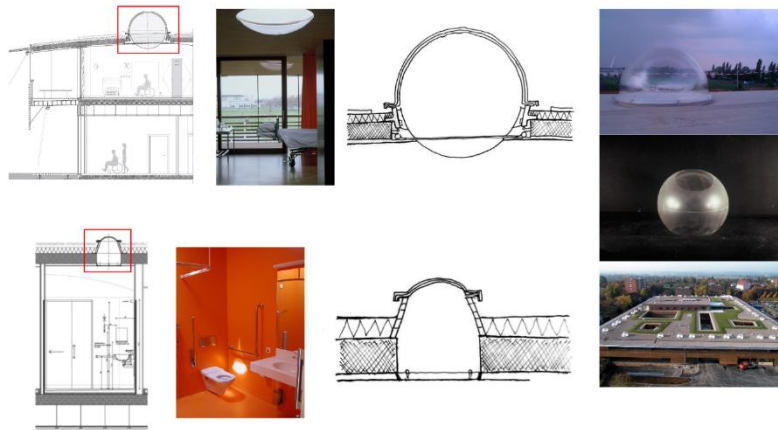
Glass Spheres (Source: Arquitectura Viva, detailed sections drawn by author)
